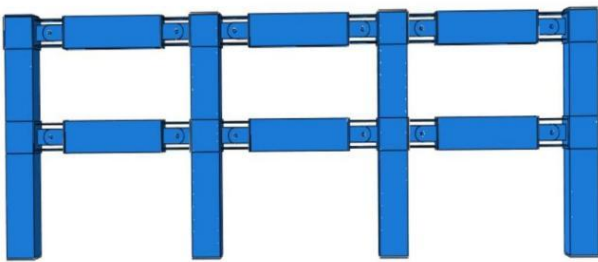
A new prefabricated frame structure with energy dissipating steel plates.
